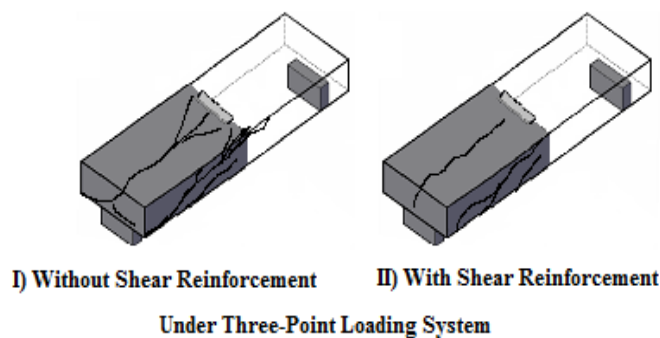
Failure Mode of Wide Concrete Beams for Case 1 of Support and Load Widths.
